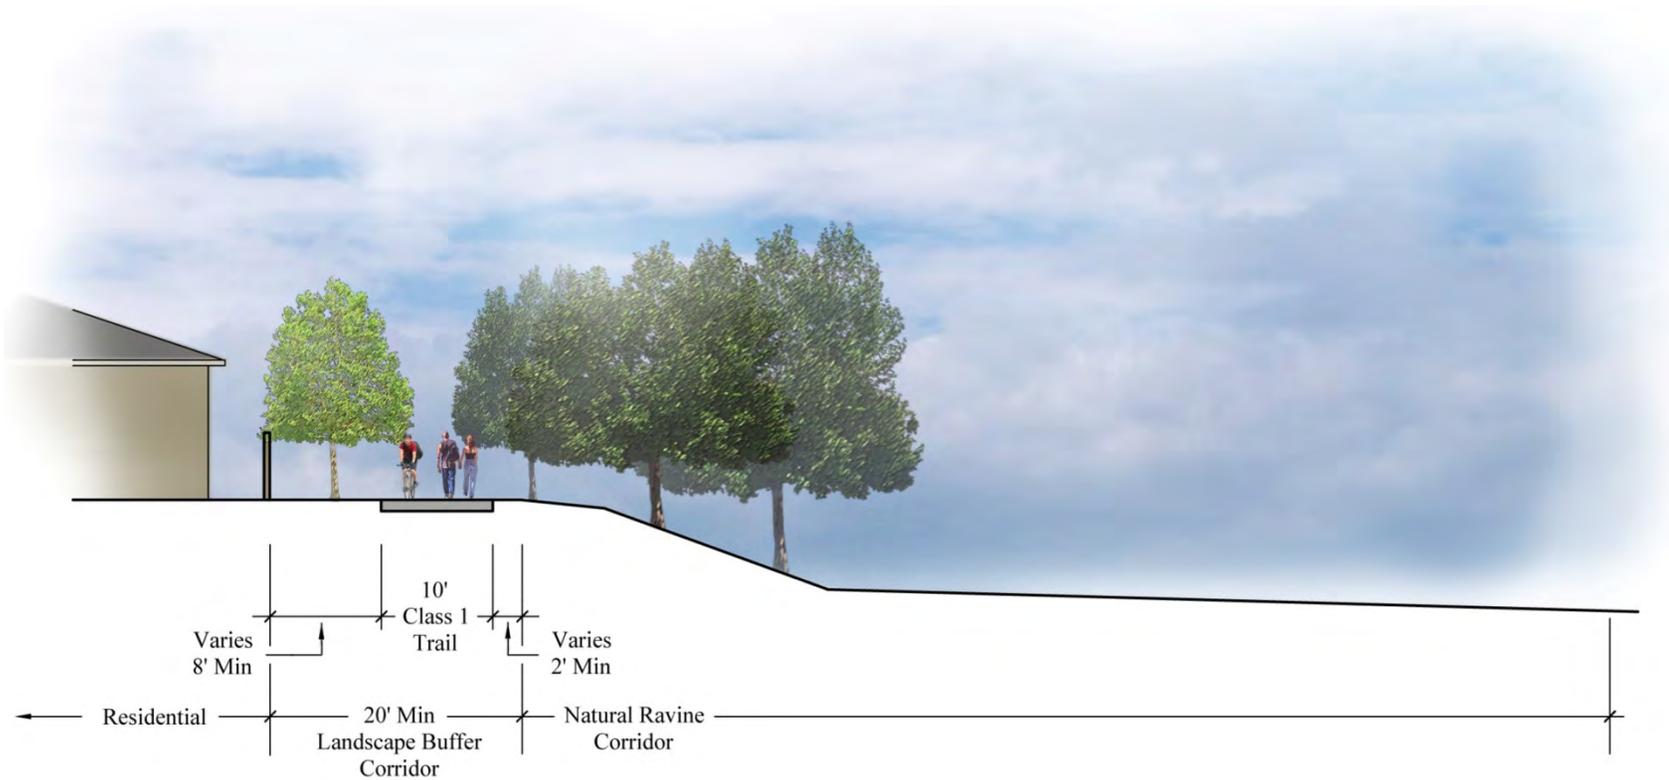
Trail Cross Section @ Auburn Ravine C-C
